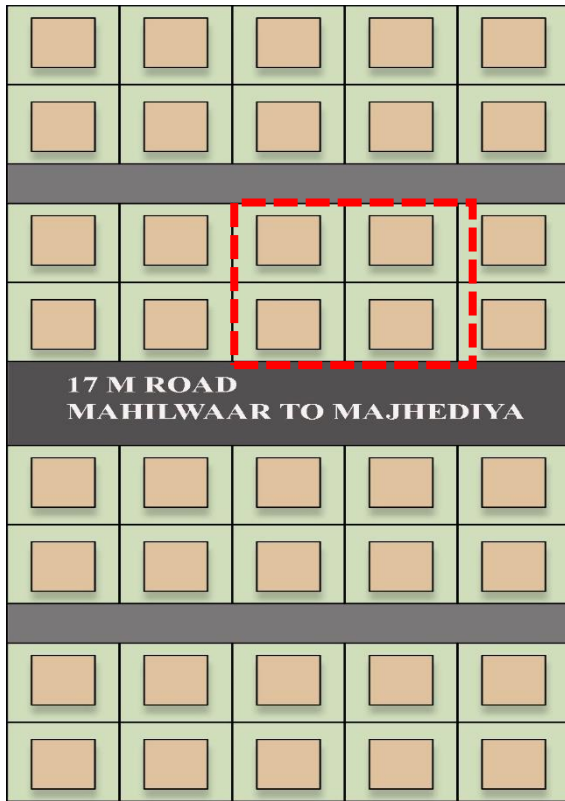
43 Building arrangement for setback 2.5m and 3.5m
